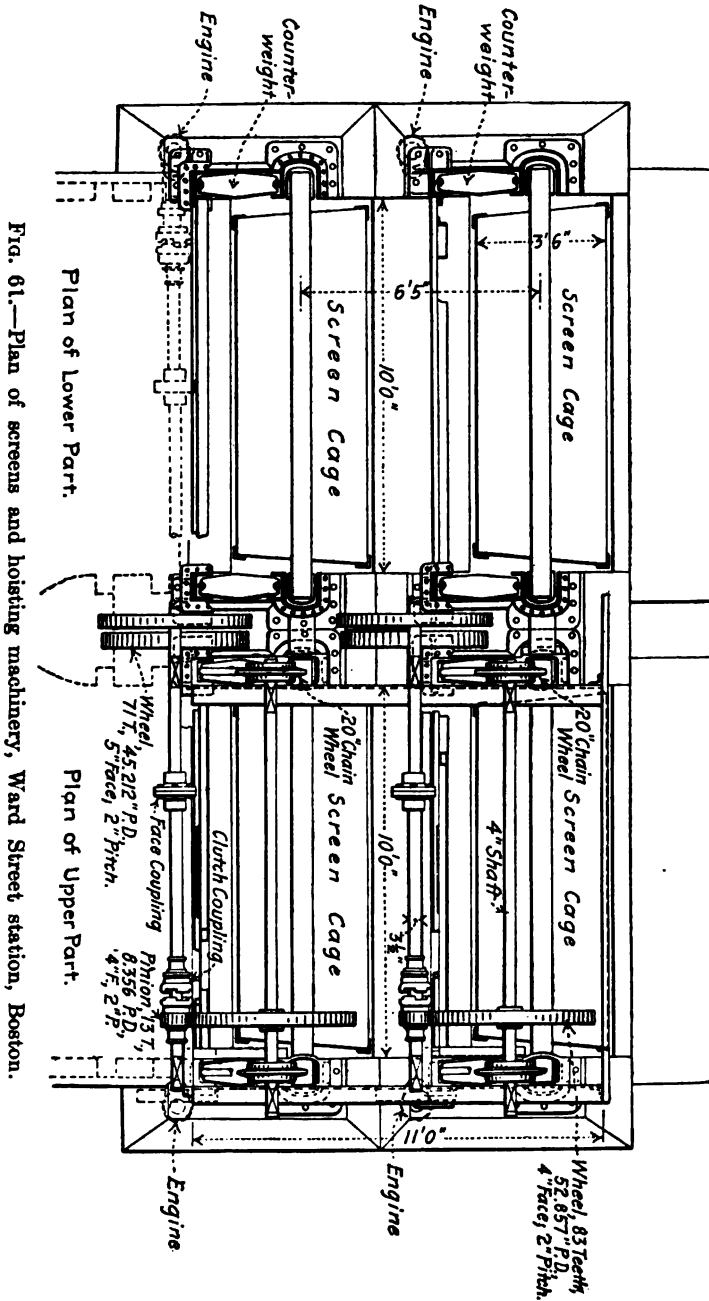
Plan of screens and hoisting machinery, Ward Street station, Boston.
